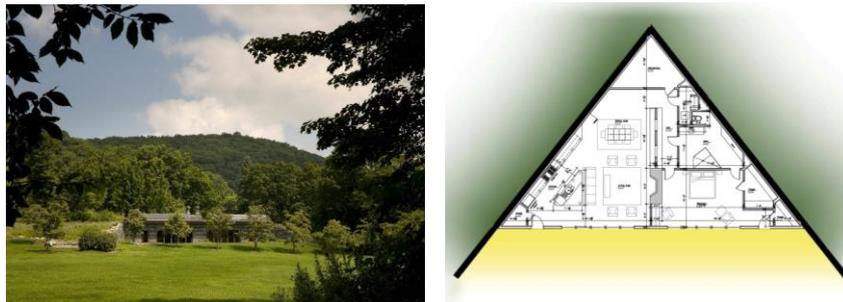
Photo of the house and sketches of the ground floor level (green-buried part, yellow-free southern facade)
